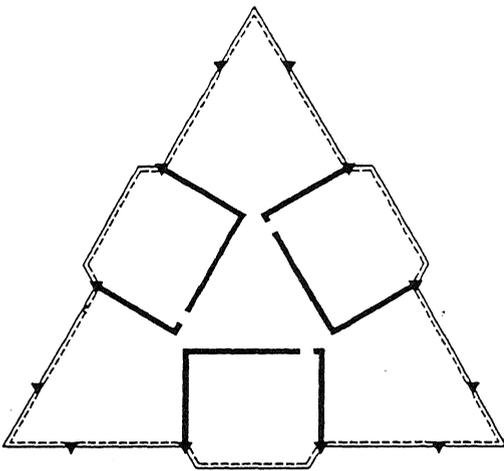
Floor plan of Torres de Miramar building, odd numbered levels from 3 up.
